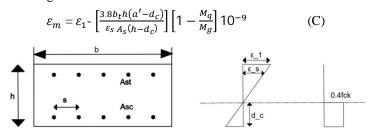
Strain and Stress Diagram for Slab Section of Bridge Deck
